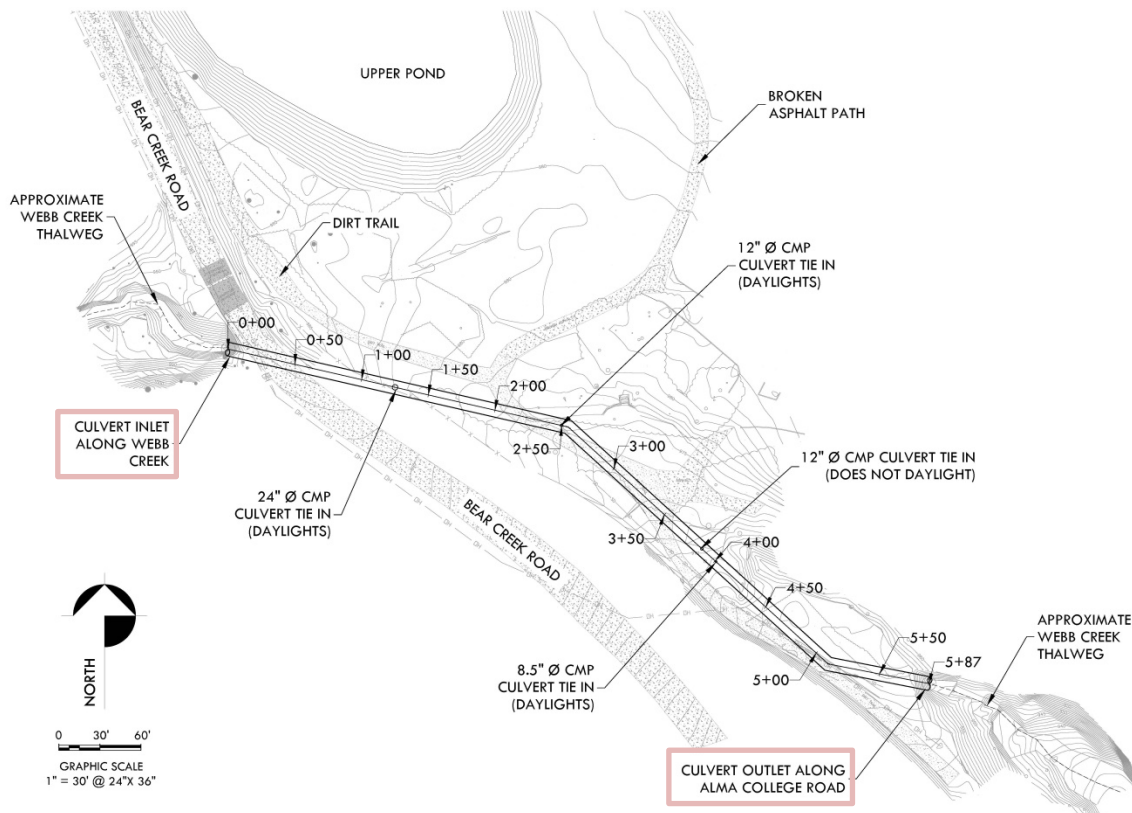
Approximate location of culvert with inlet and outlet highlighted in red. Note that minor pipe bends not shown and the true and accurate location of the culvert needs to be verified before any construction commences.
